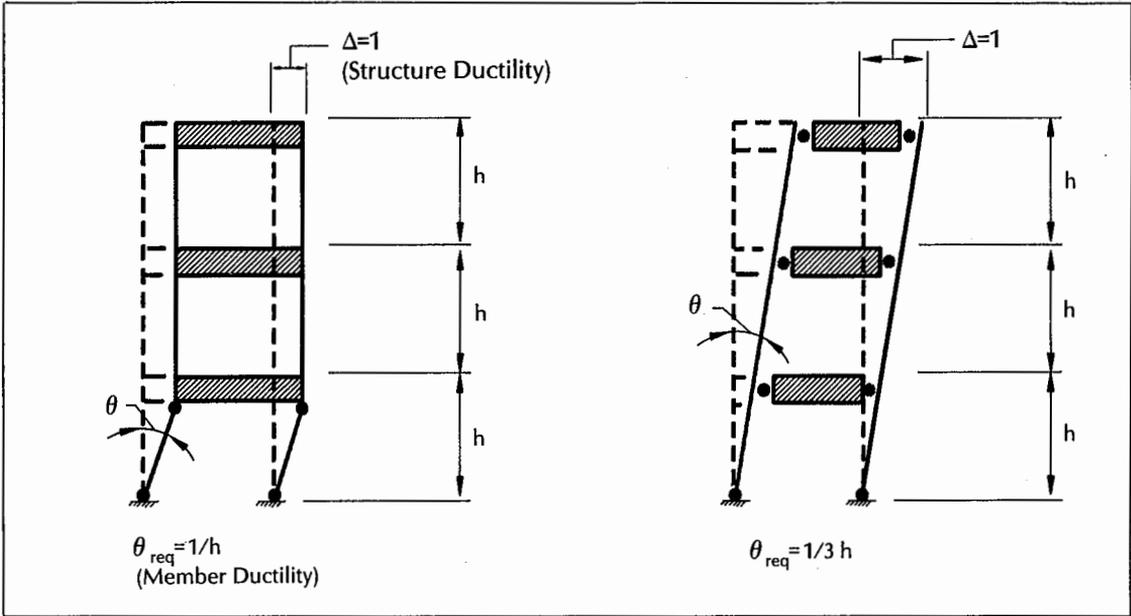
Lower member ductility requirements for a frame with plastic hinges in the girders.
